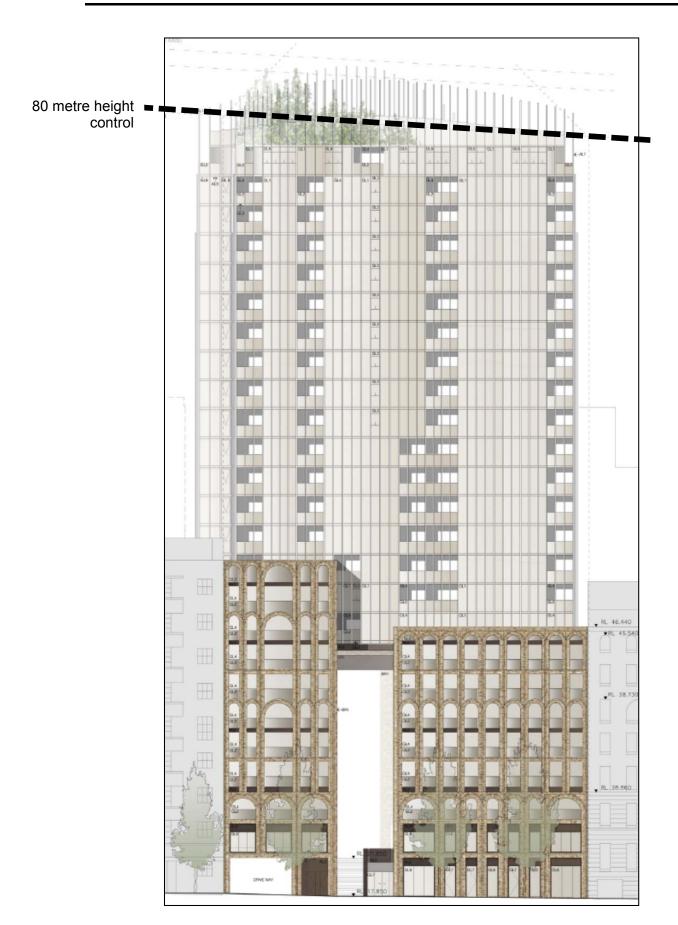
View of Kent Street elevation of the development illustrating the extent of technical breach to the building height development standard
